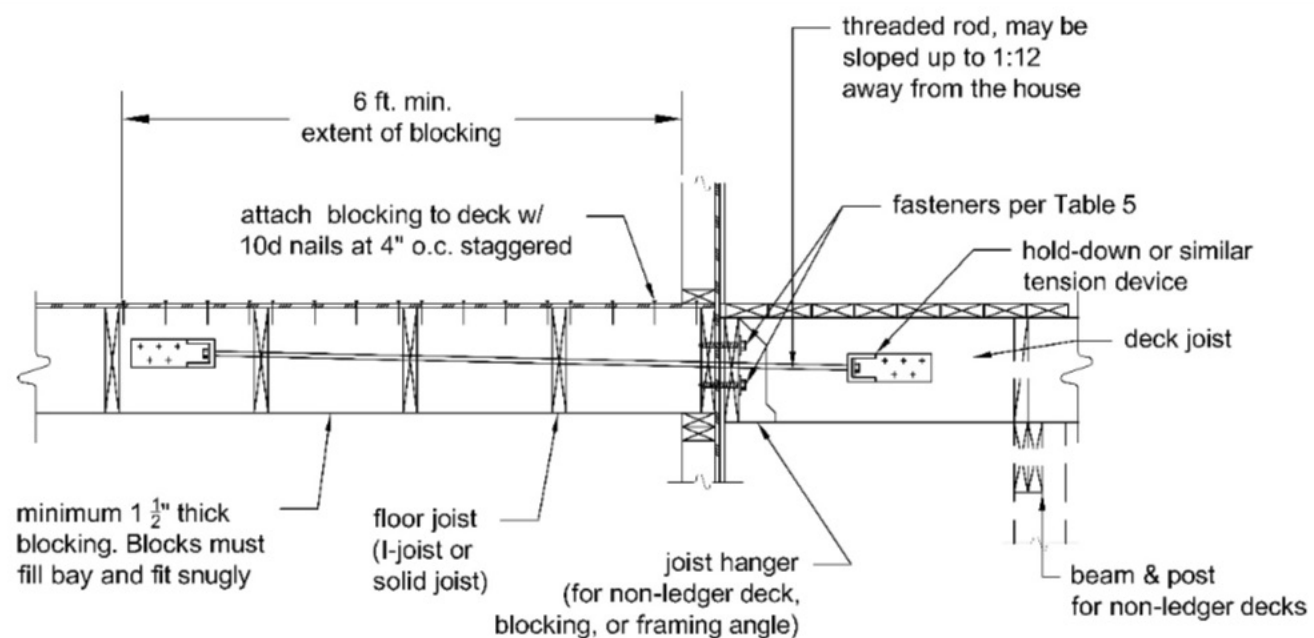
Lateral Load Device with Floor Joists Perpendicular to Deck Joists.
